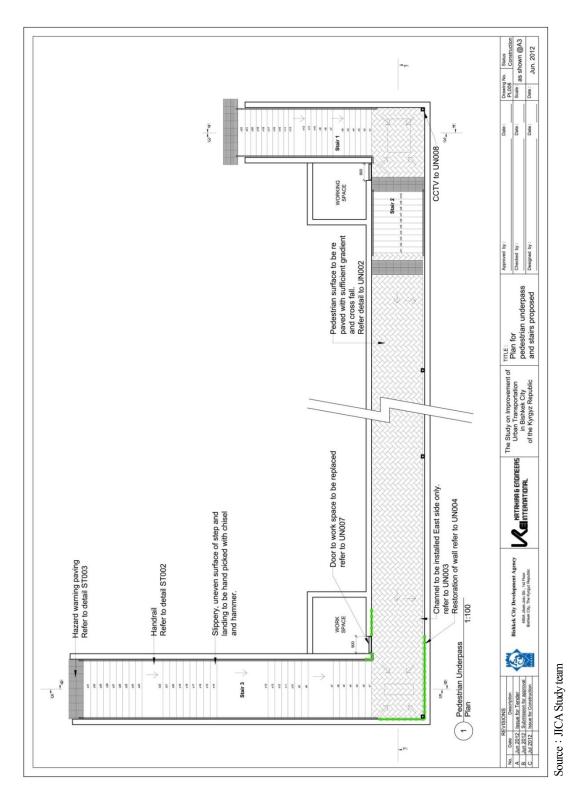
Proposed Pedestrian Underpass
